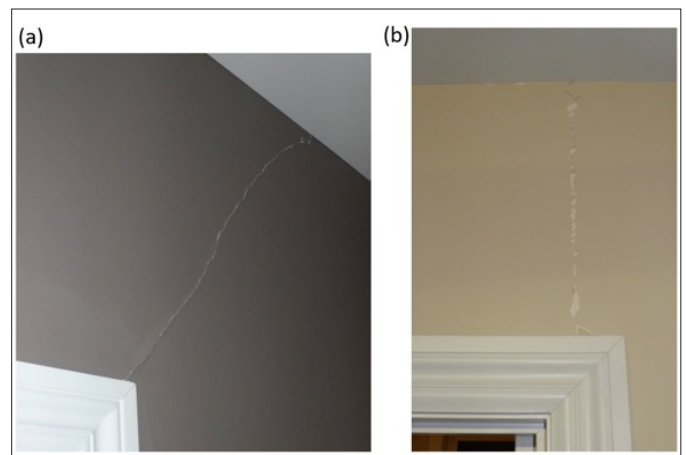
Plasterboard bracing walls damage after the 2010 Darfield earthquake: (a) diagonal cracking of plasterboard; (b) vertical cracking of plasterboard [8].
